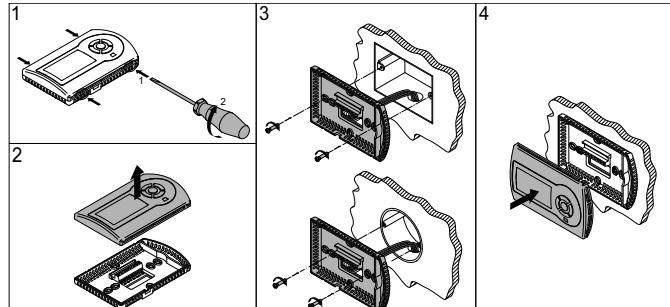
Wall mounting THS2. Spacing between 83,5 mm fixing holes with box, for example: Bticino 503E. Spacing between 60 mm fixing holes with round box, for example: Gewiss GW 24 232.
